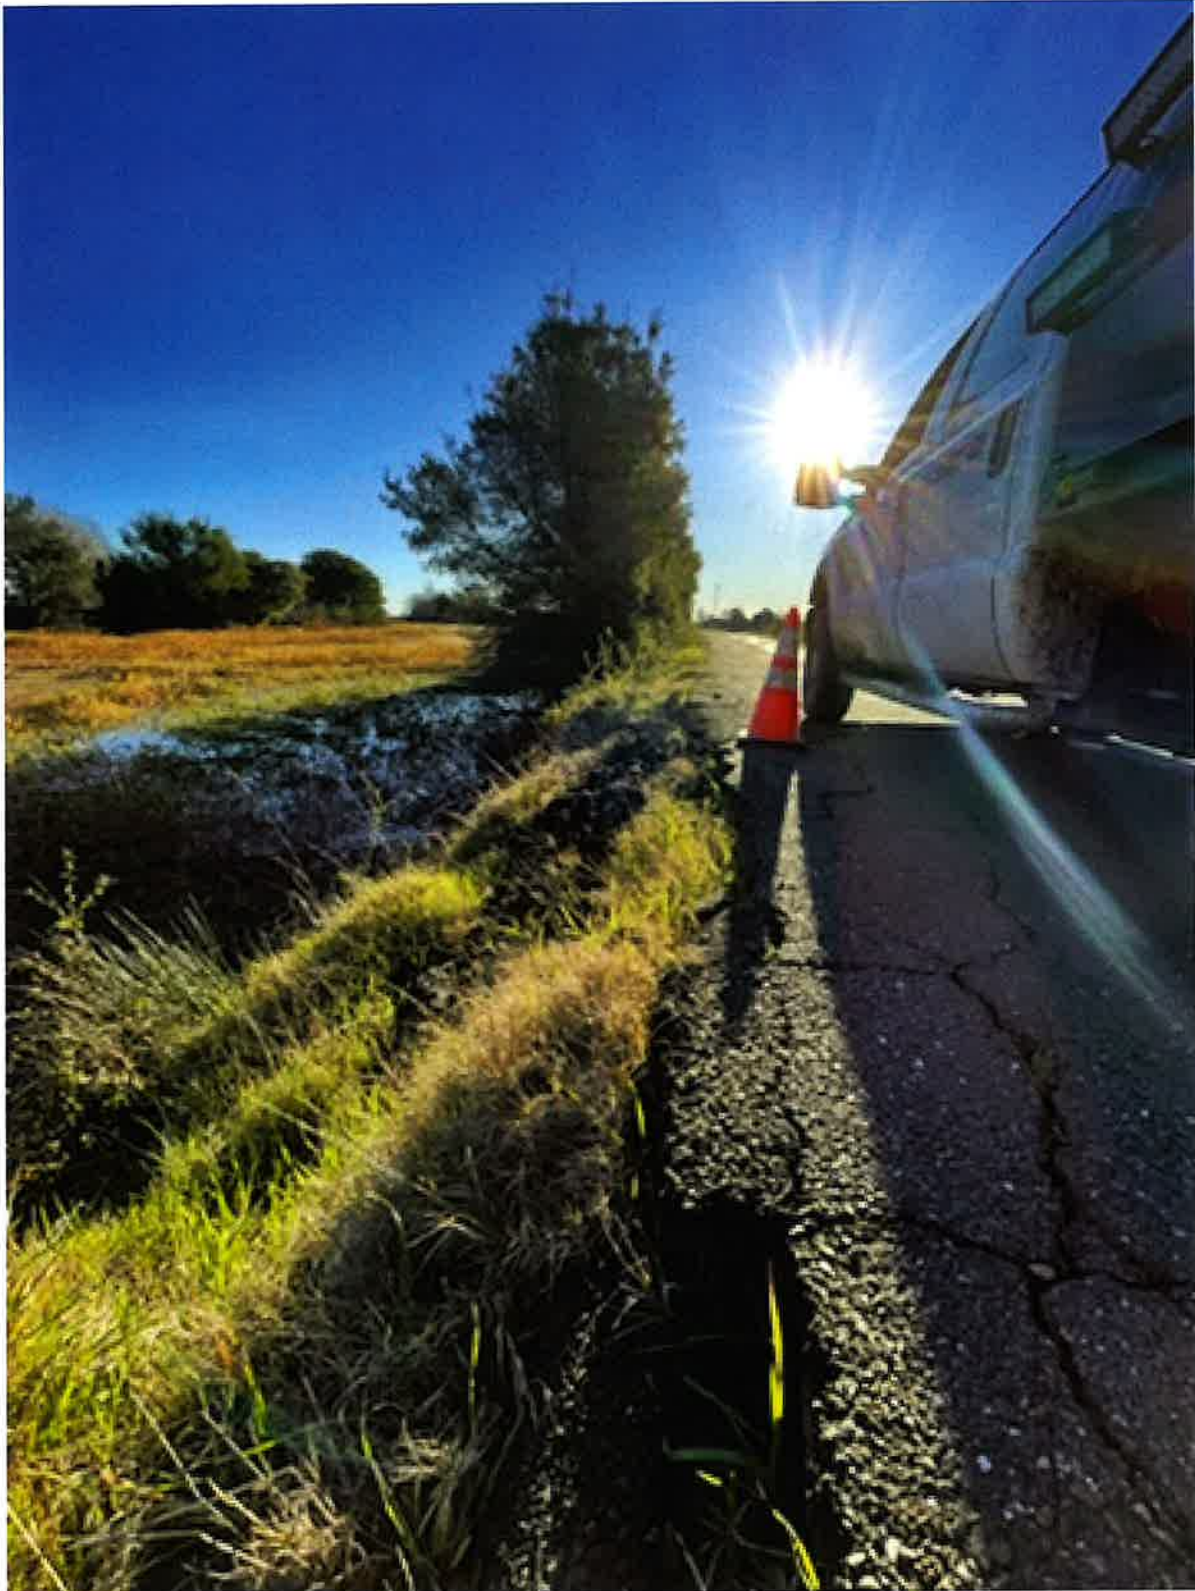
EXISTING DAMAGE SITE CONDITIONS
